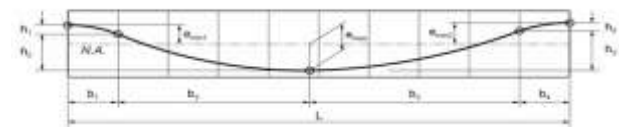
Typical Interior span Tendon profile for continuous superstructures
